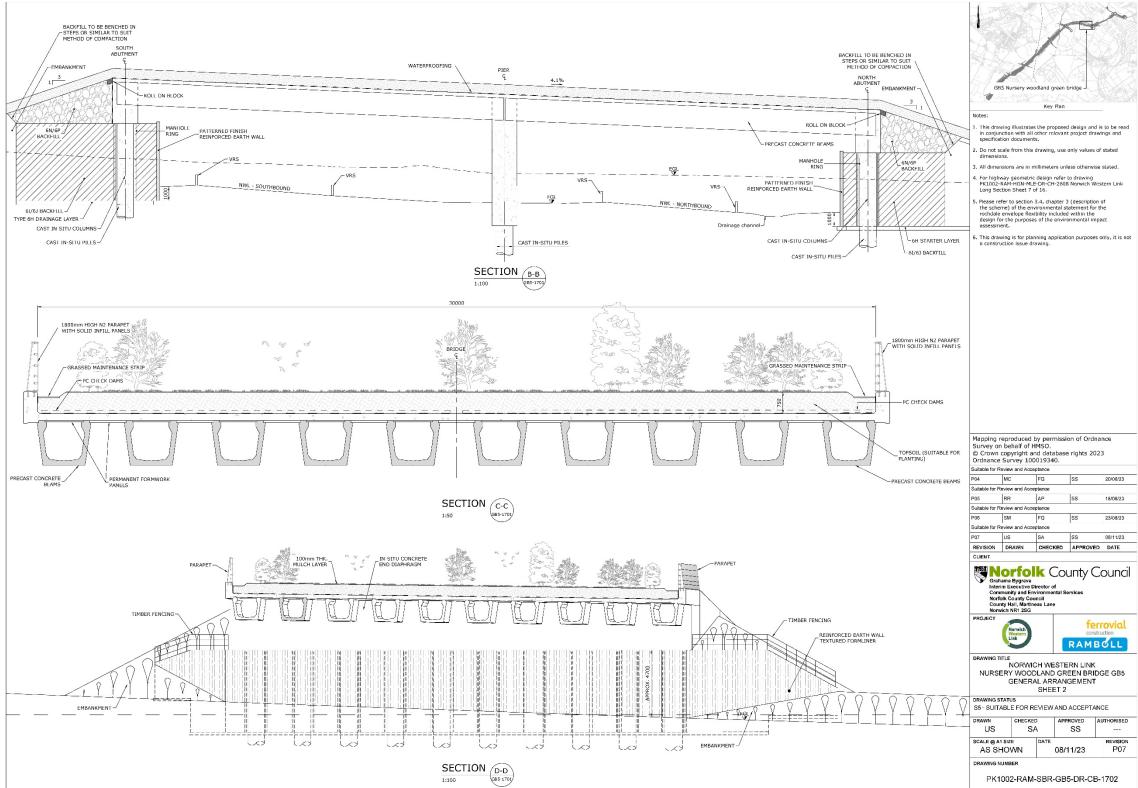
The General Arrangement Drawings for The Nursery Woodland Green Bridge GB5, illustrating the structural cross section of the green bridge
